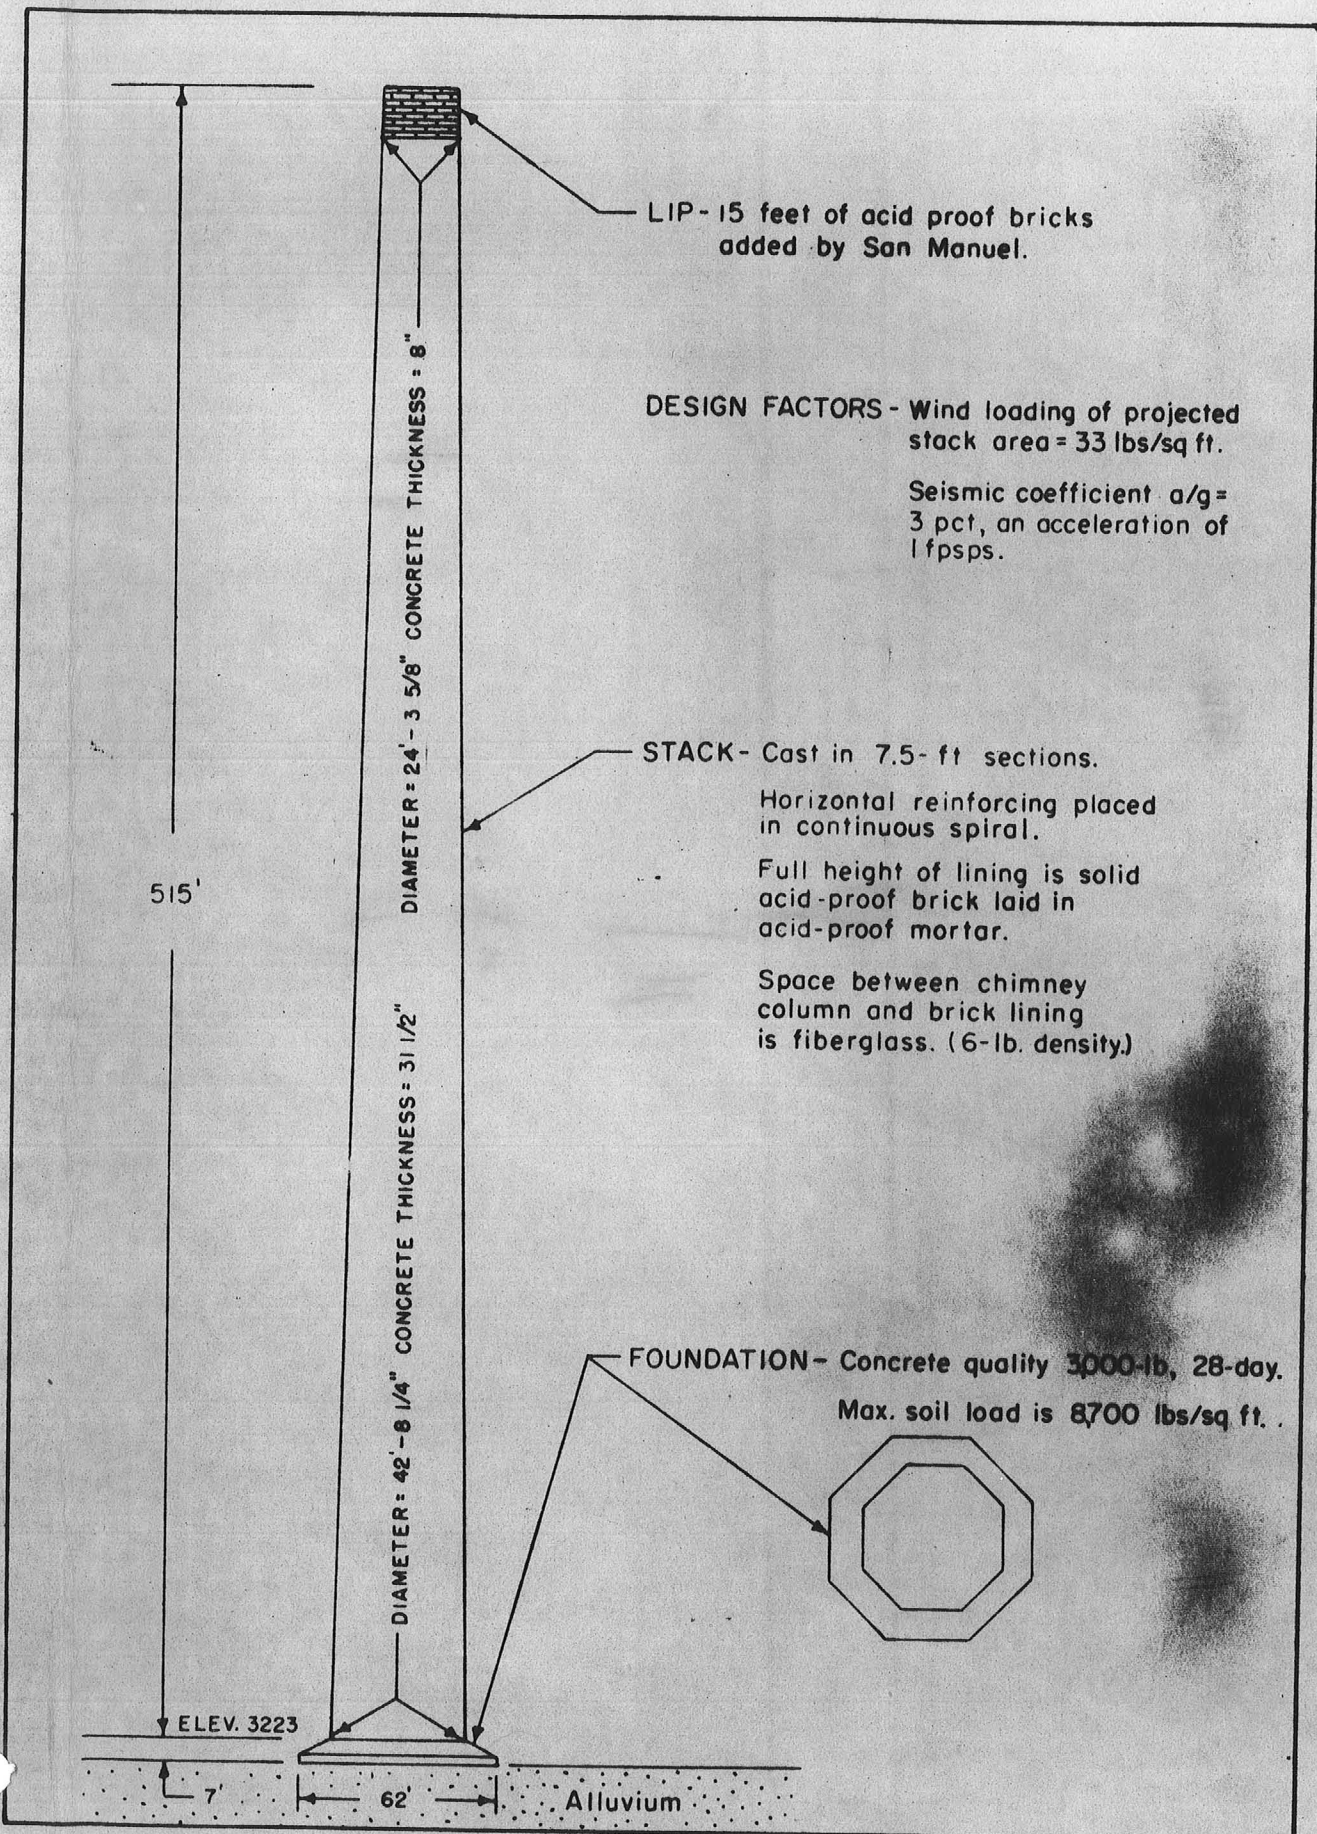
Reinforced Concrete Smelter Chimney, 500' X 20', San Manuel, Ariz.
